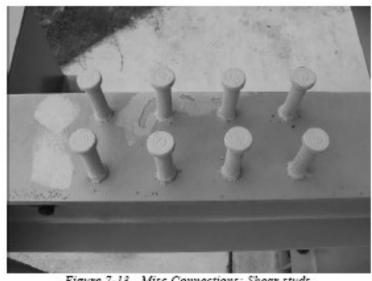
Misc Connections: Shear studs. Girder B1 / Shear Studs
